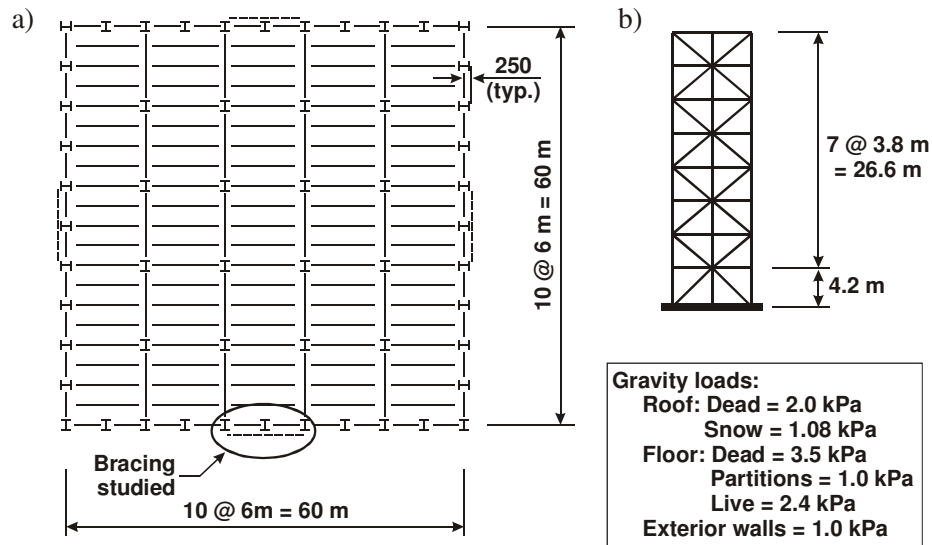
Buildings studied: a) Plan view (4-, 8-, and 12-storey buildings); b) Braced frame elevation (8-storey building shown).
